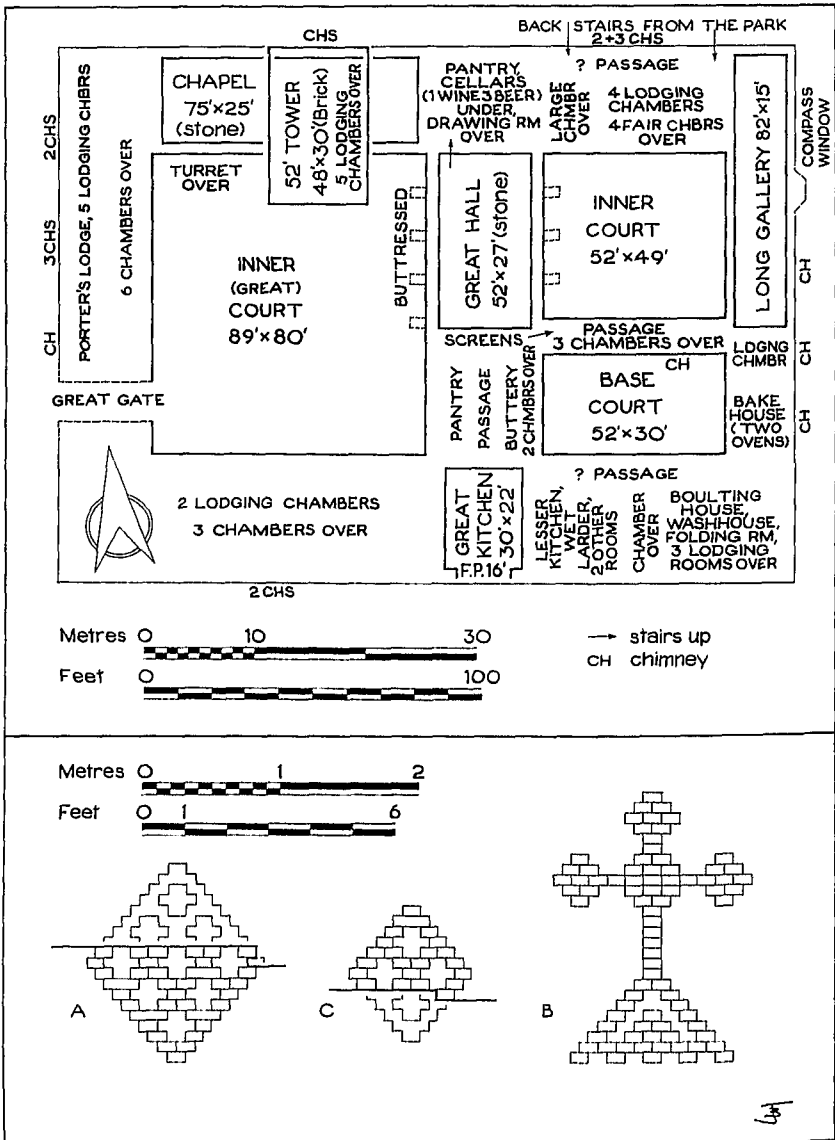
Layout of buildings based on 1647 Survey, and patterns of brick on farmyard wall; drawn by John Bowen.
